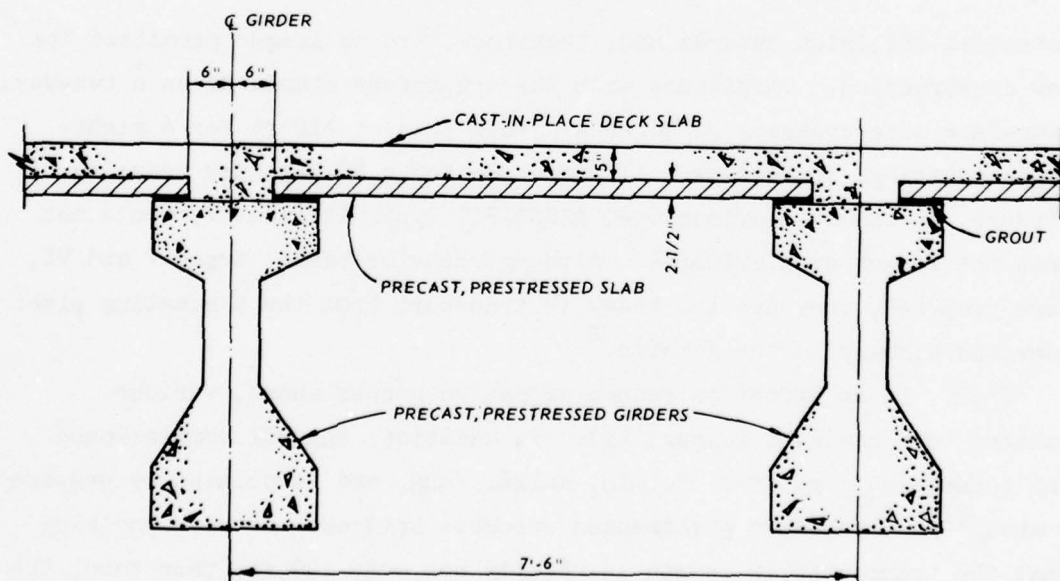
I-shaped girder cross sections and reinforcing (from Reference 20)
